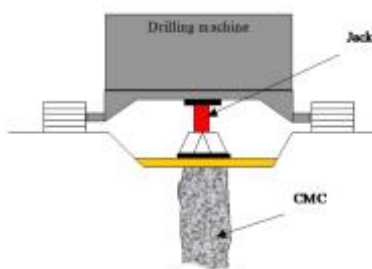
Setting Up of PLT / Vertical Plate Loading Test
